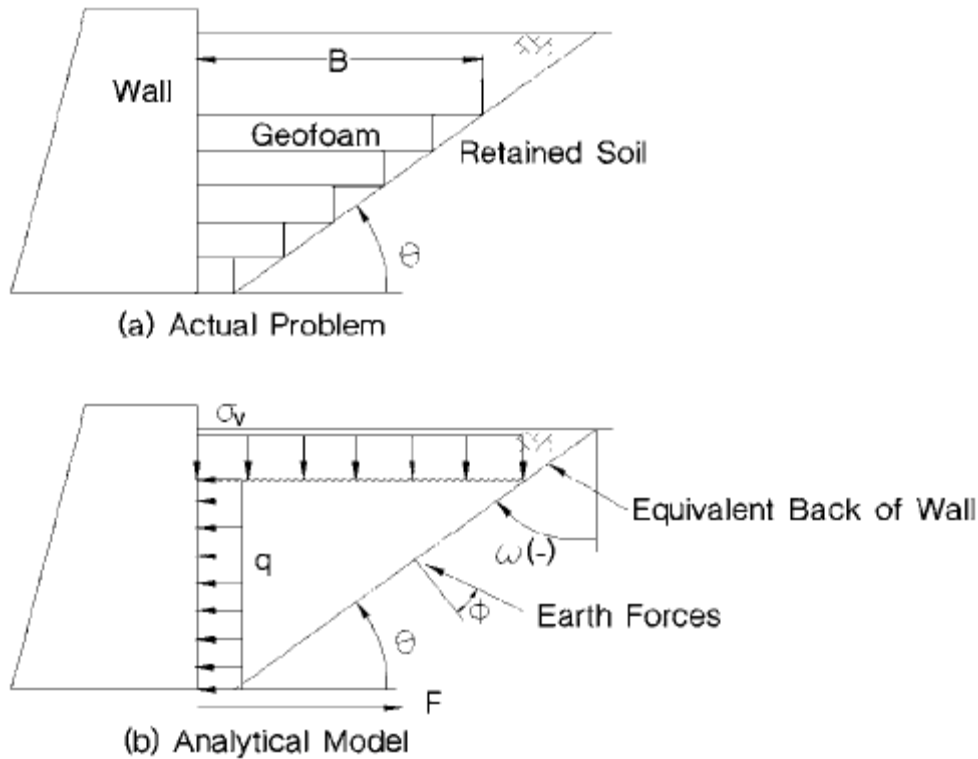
Gravity Load Components on a Vertical Wall (from Stark et. al. 2004).
